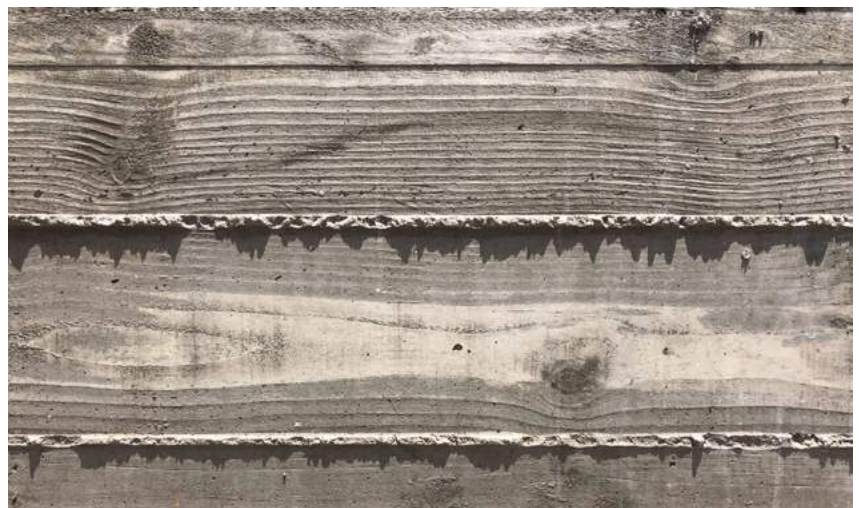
/08 Board formed concrete is imprinted with the grain texture of the formwork.
